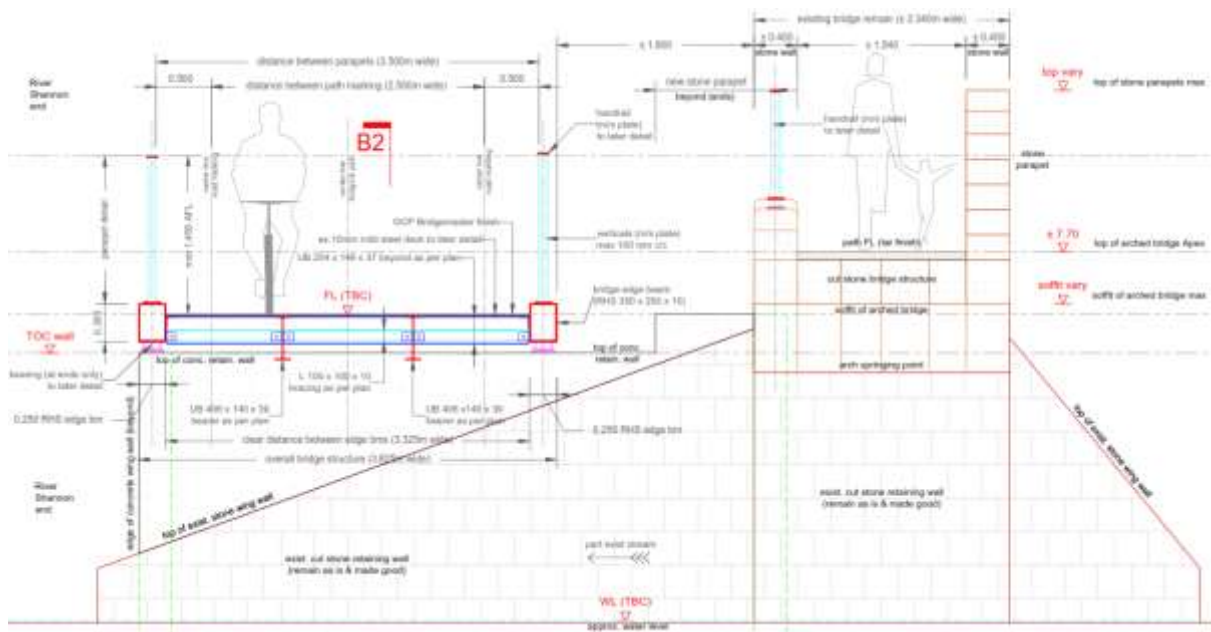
Section for the proposed new bridge 2 alongside the existing stone bridge (refer to drawing RHA-XX-DR-S-SP0021)
